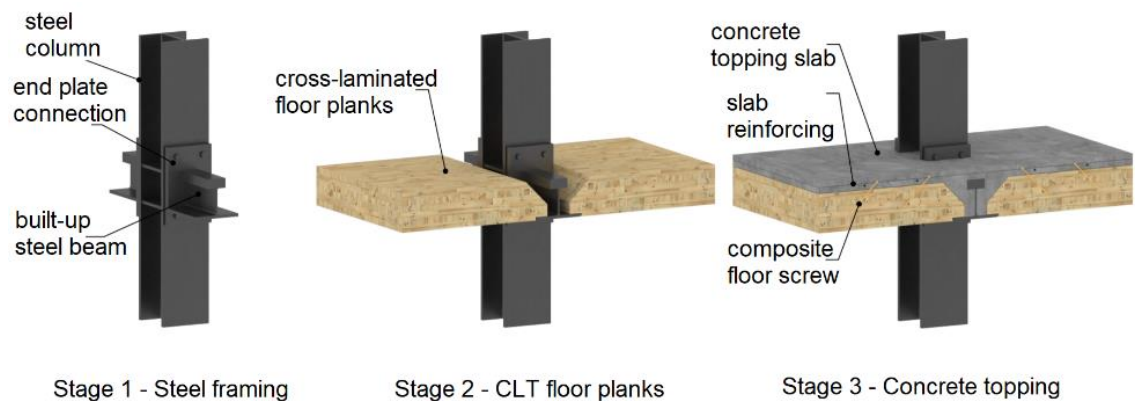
Composite cross-laminated timber (CLT) floor solution (AISC 2017)
